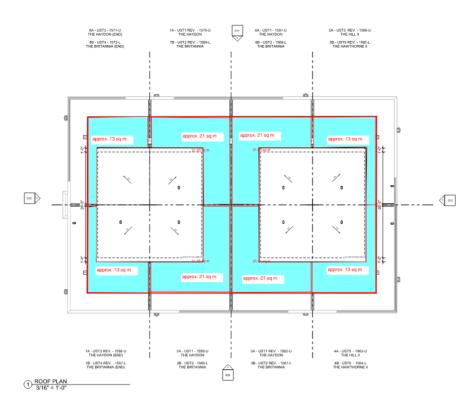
Area of rooftop terraces on 16 unit stacked dwelling building with 1.5 metre setback (Block 4 of Site Plan).
